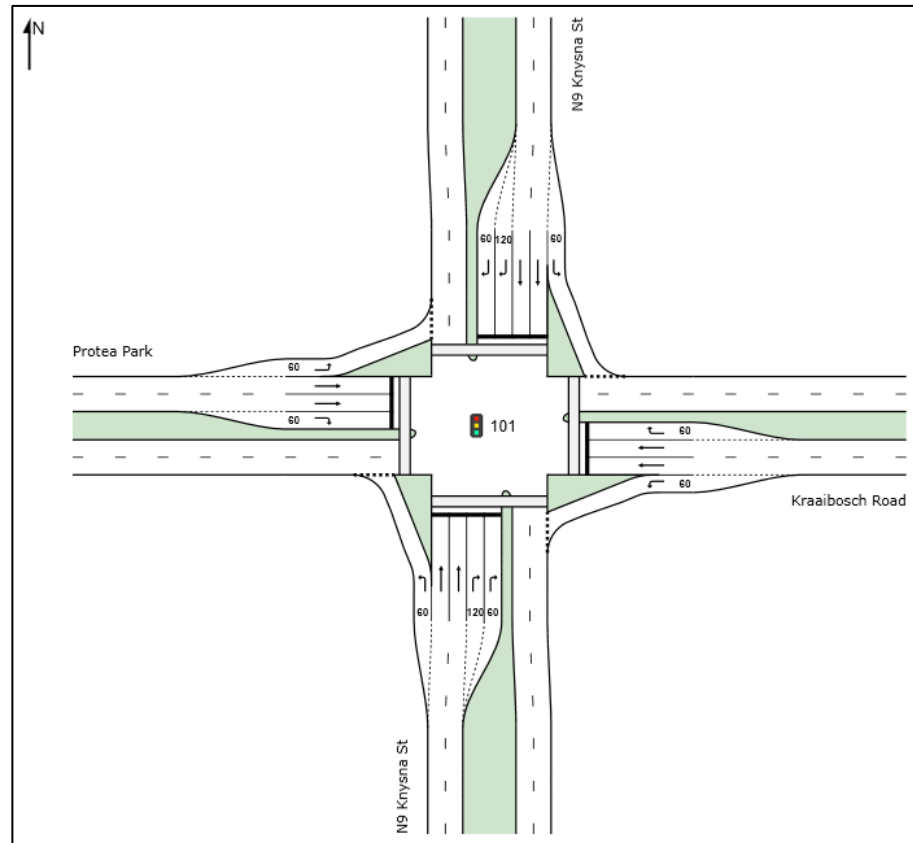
Layout: N9 Knysna Street & Kraaibosch Road
